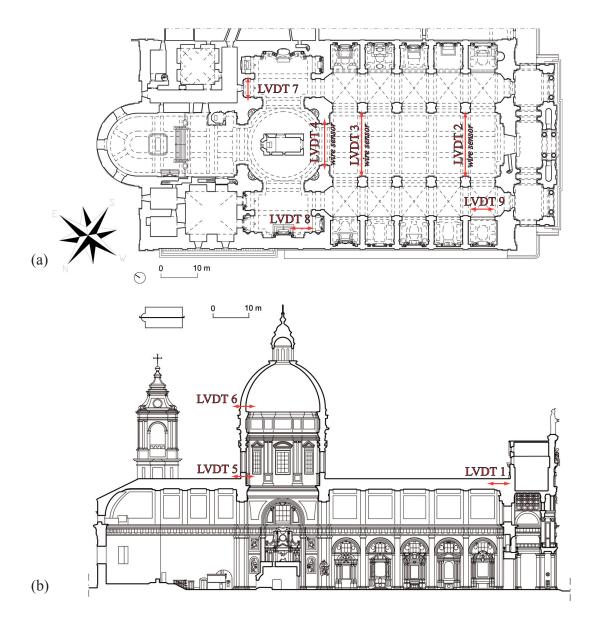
LVDTs' installation layout. (a) Plan. (b) Longitudinal section.
